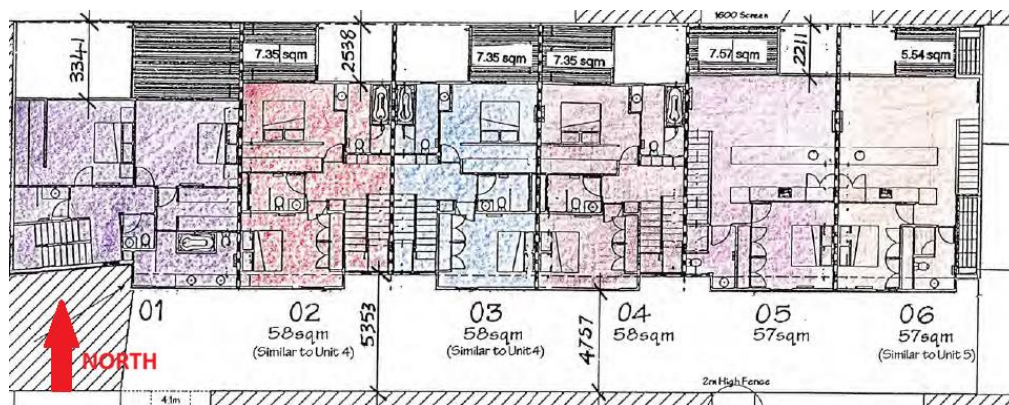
No. 7 Sanders Place endorsed first floor plan (PL01/0765)
